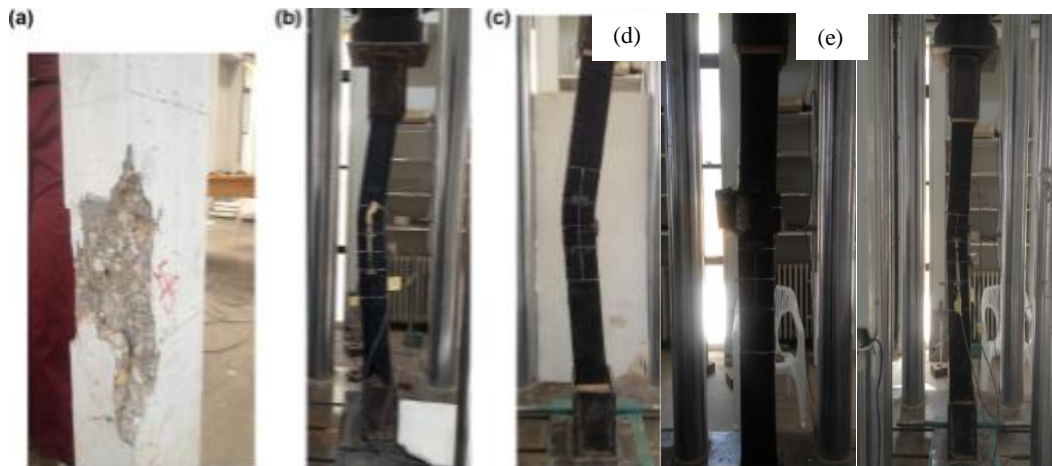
Failure modes of (a) control specimen; (b) neat epoxy specimen (NE); and (c) CNT-modified epoxy specimen (CNTE); (d) neat epoxy with sizing agent specimen (SNE); and (e) CNT-modified epoxy with sizing agent specimen (SCNTE) [99].
